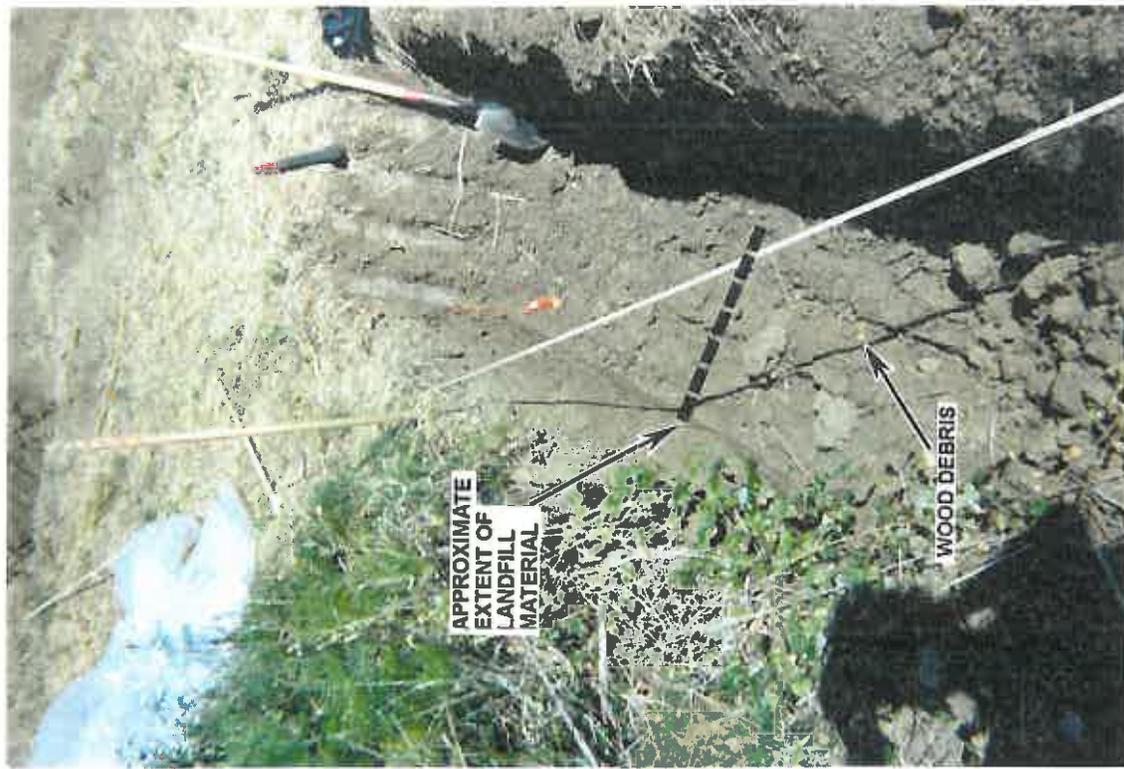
Test Pit LFP-27, landfill material pinches out half way across trench.
